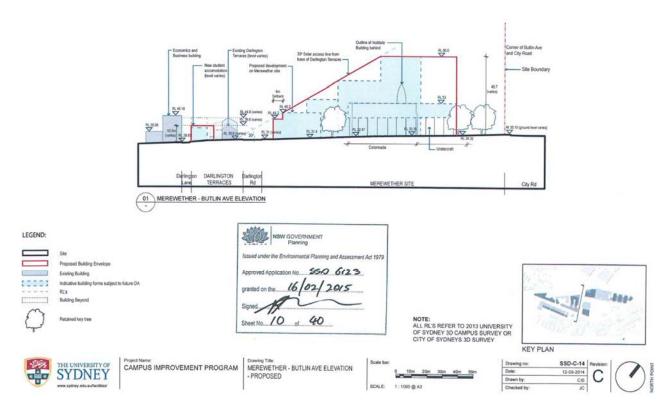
Merewether Precinct – Proposed Butlin Avenue Elevation
